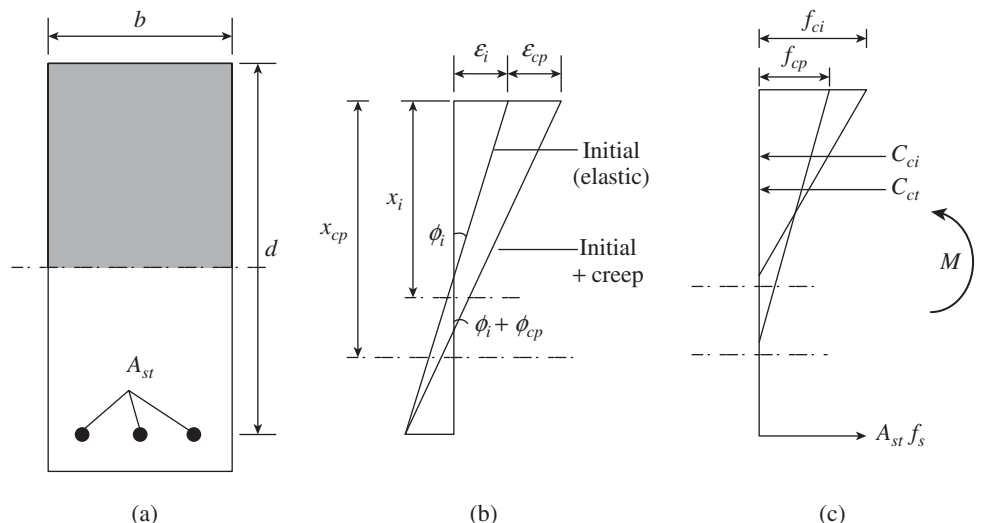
Strain and stress distribution in an RC beam subjected to creep (a) Cross section (b) Strains (c) Stresses
